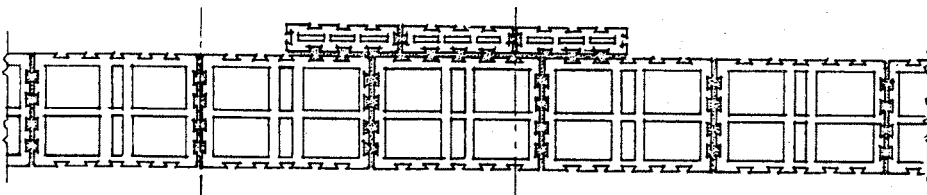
Section plan of a hollow tile wall revealing the dovetails integrated into each unit (from National Fire Proofing Co., *Builders Handbook of Natco Hollow Tile Construction*, 11).
